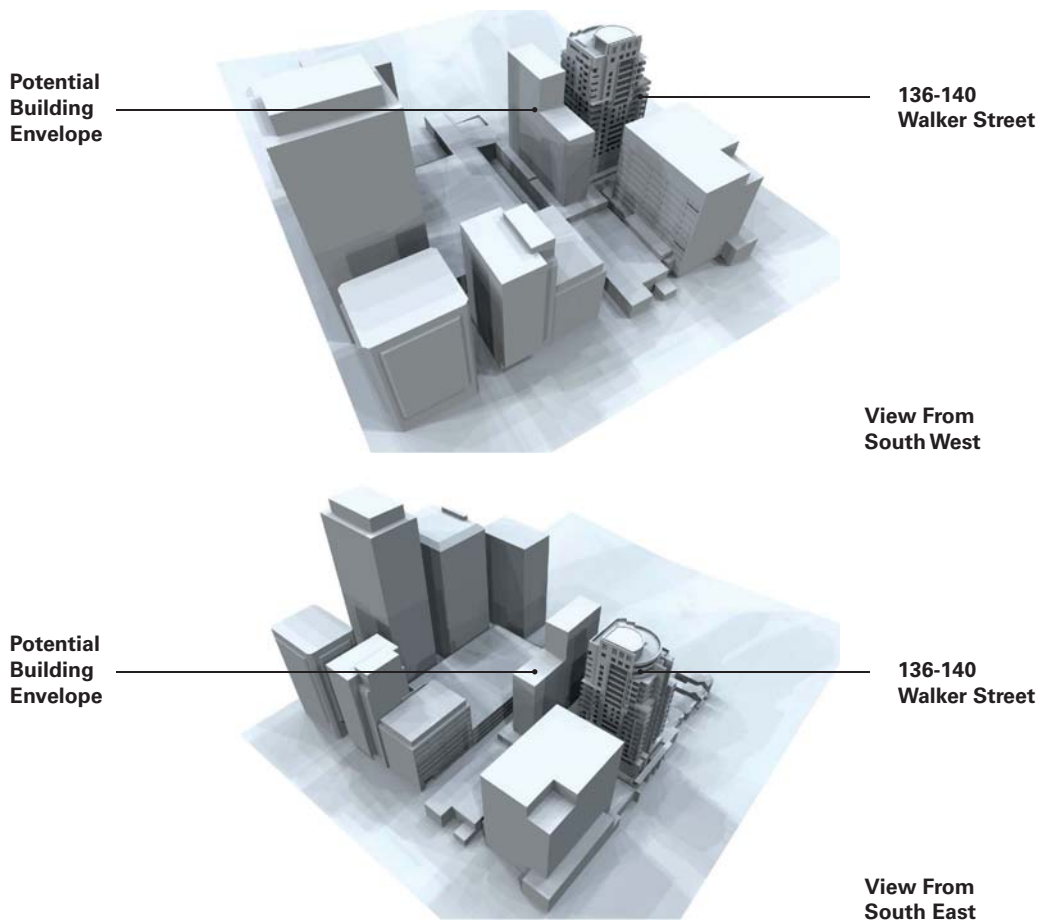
Proposed Development at 136-140 Walker Street and Potential Building Envelope at 3-11 Ward Street
